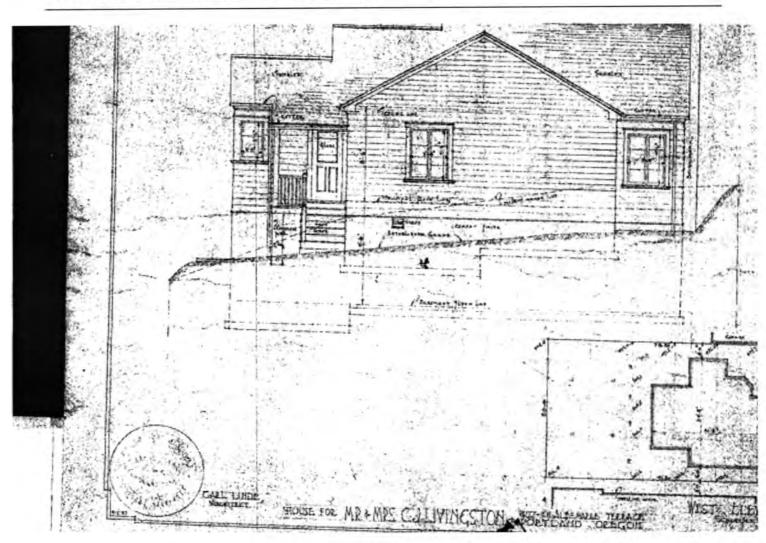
Original drawing for the C.J. Livingston House, showing west elevation.
